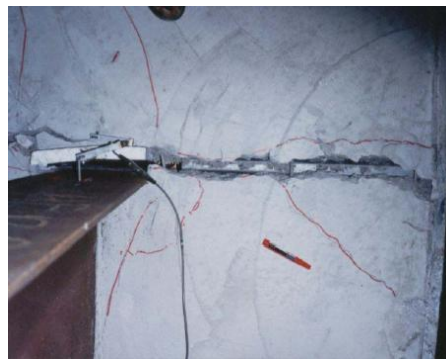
Slab damage in a post-tensioned steel beam subassembly (Clifton, 2005).
